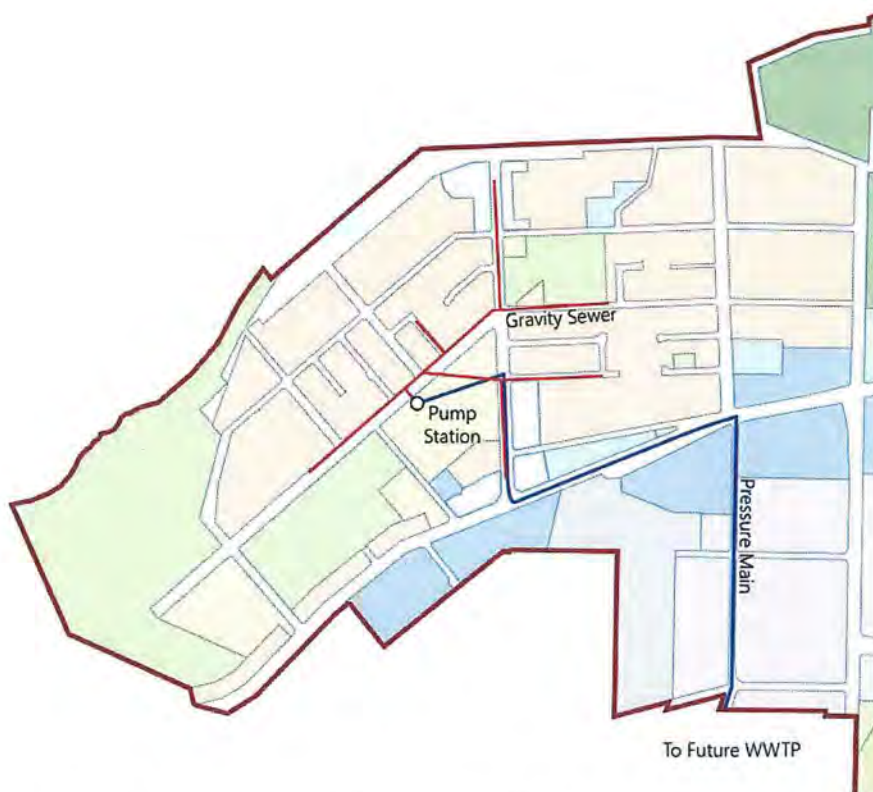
Indicative sewer alignments to facilitate Stage 1 (subject to detailed design)
